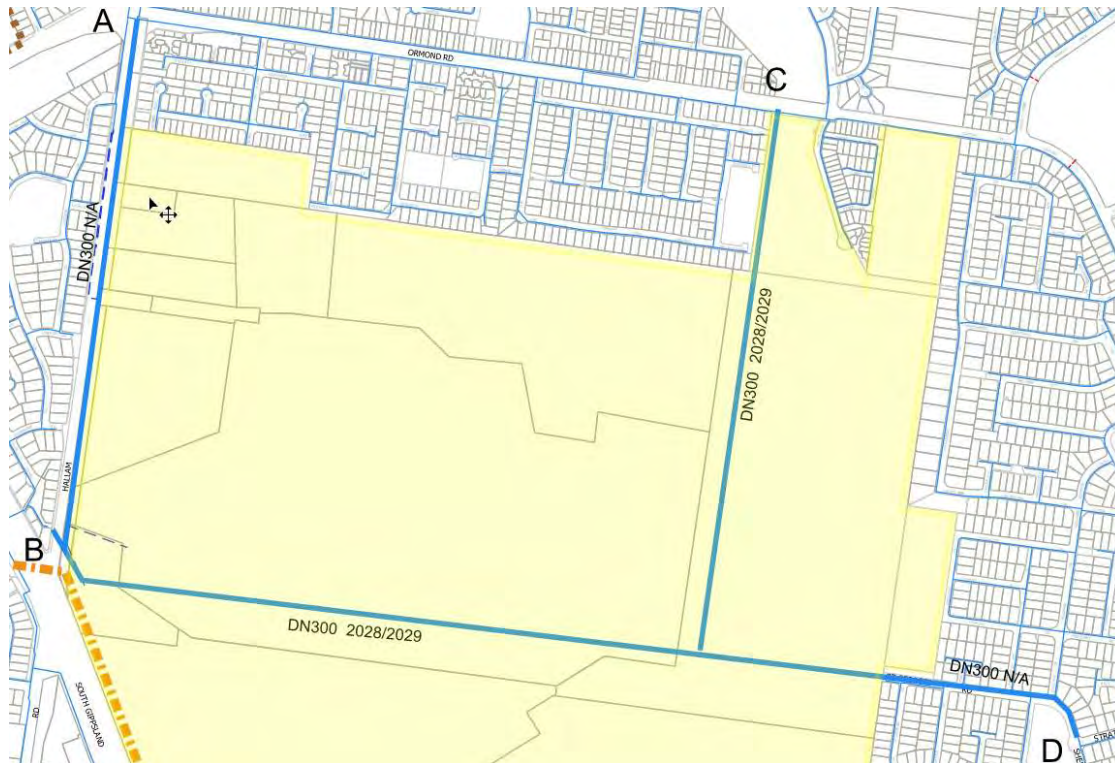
South East Water proposed indicative alignment plan (SEW advise letter – Appendix C)
